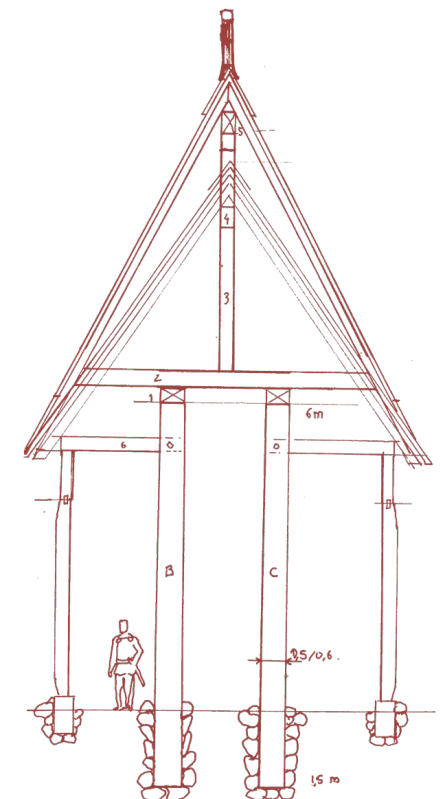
Reconstructed section of the temple, showing the stave construction. by Louis Lecareux, Used with permission
